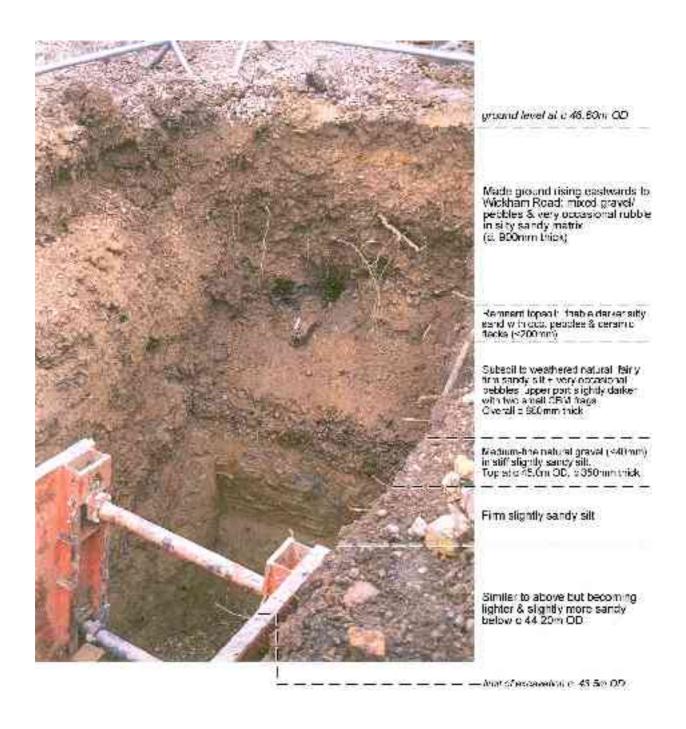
Detail of exposed section of the pipe trench on the eastern side of Kelsey Park, looking northeast (for location see Fig 4)
